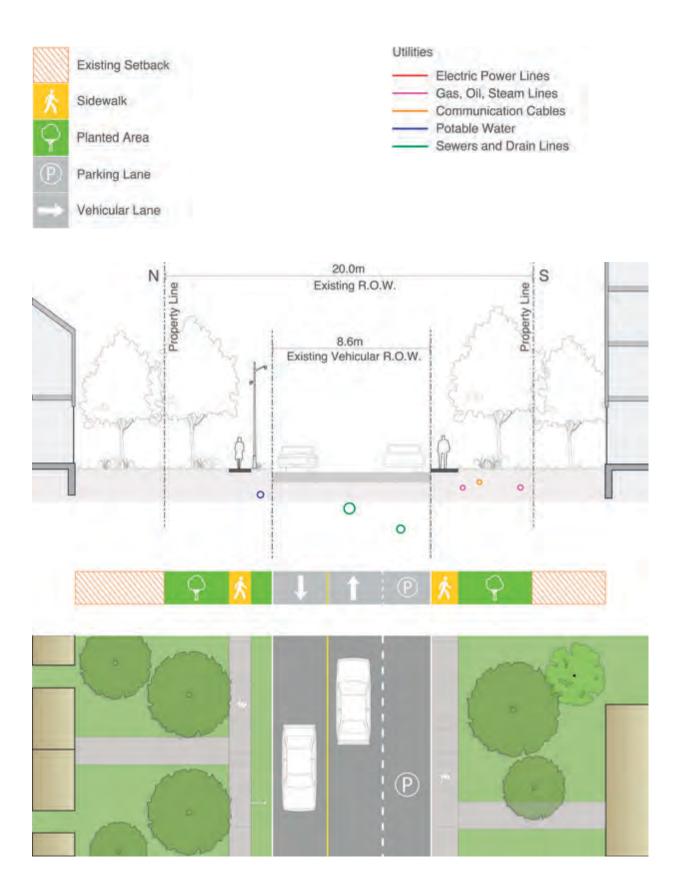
Section and Plan of the Existing Conditions of Keewatin Avenue
